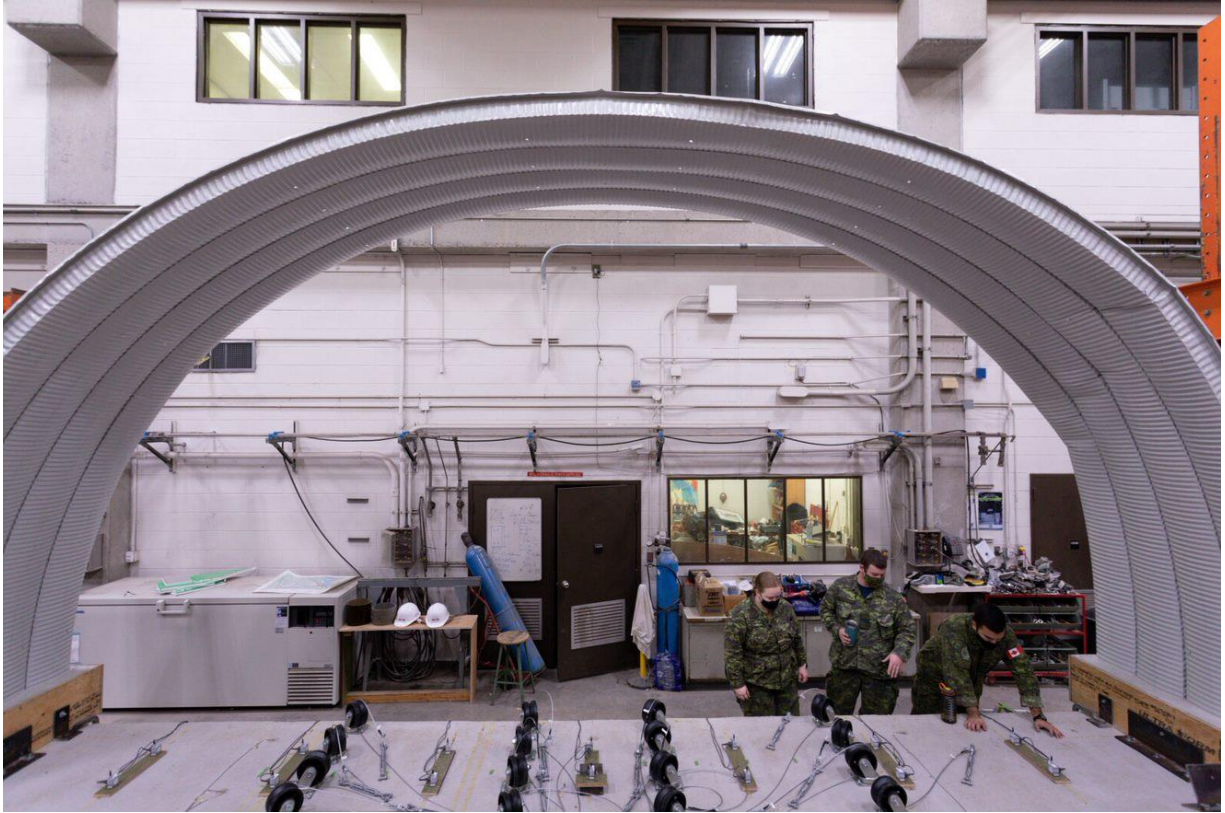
Balanced Loading & Fixed Support Specimen Post Loading
